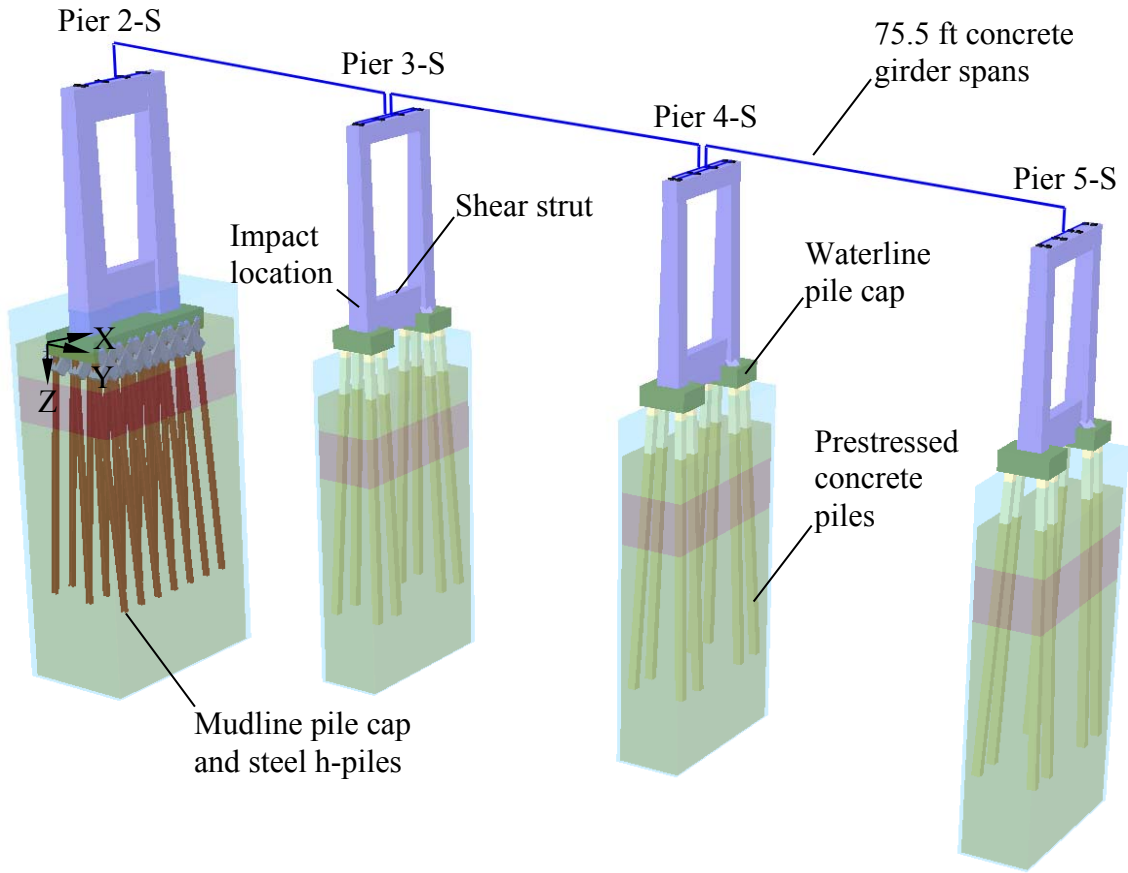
Old St. George Island Causeway bridge partial-bridge FBMP structural model
